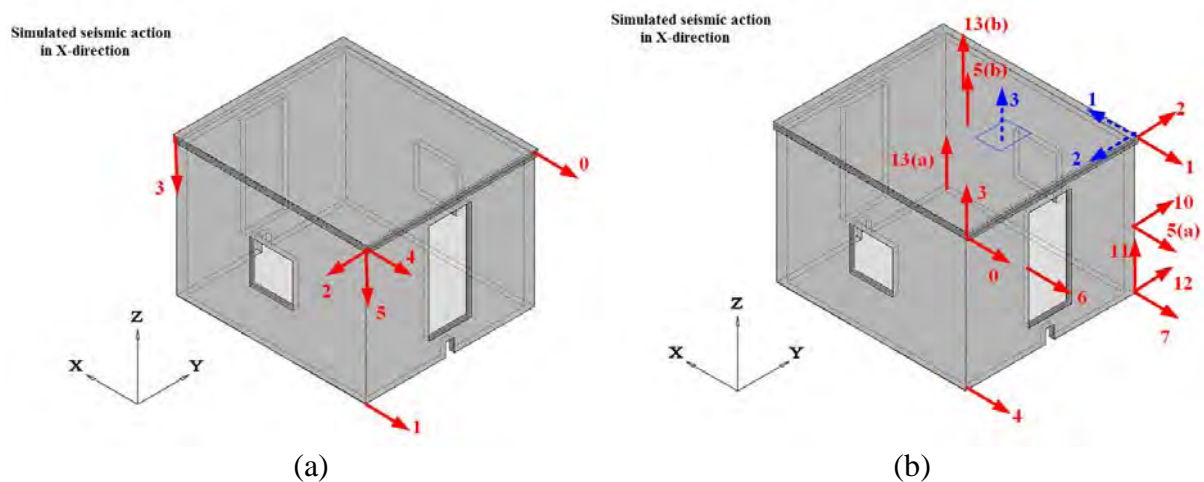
Sensor configurations (positions) and hammer impact points on the masonry structure, (a) un-reinforced building, (b) reinforced building.
